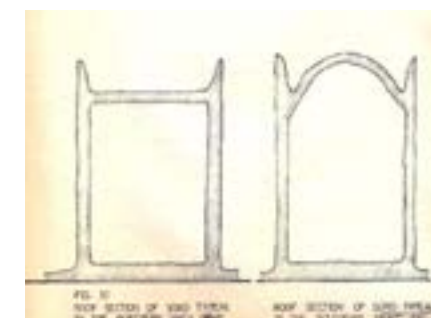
B: SECTION SHOWING TRADITIONAL HAUSA ROOF CONSTRUCTION
